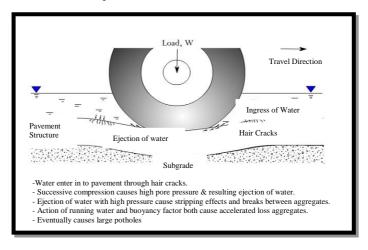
Pavement Failure Under Submerged Condition
